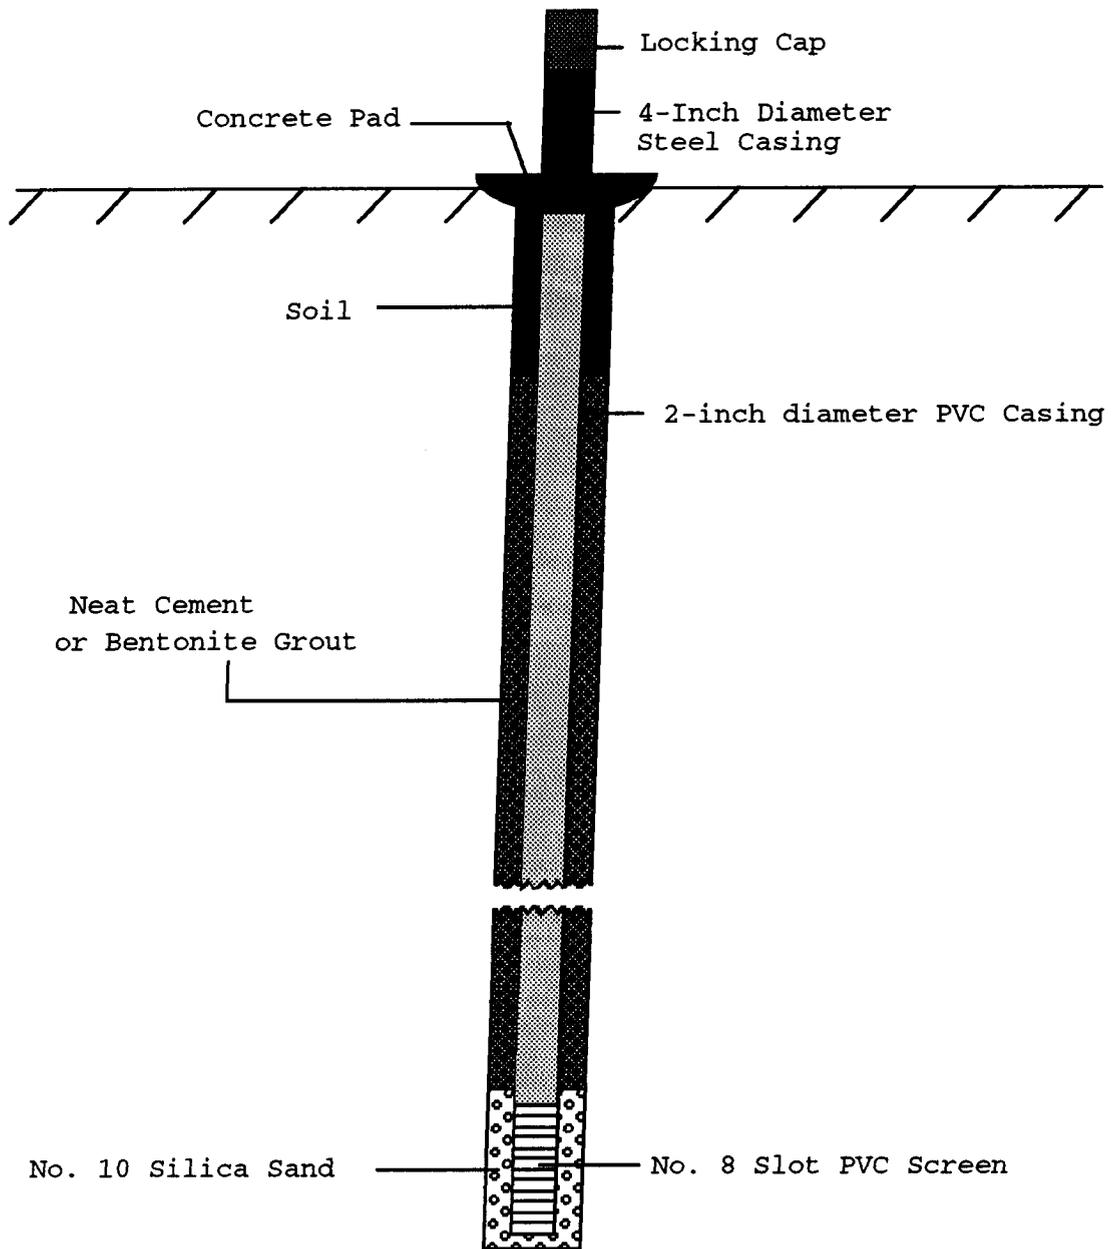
Construction design used for monitoring wells installed at the Alsen landfill.
